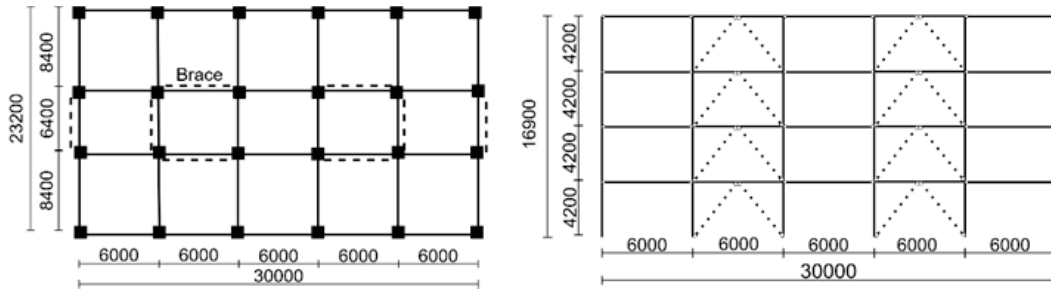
Diagram of a) Floor plan, b) Model elevation plan of the verification study building
